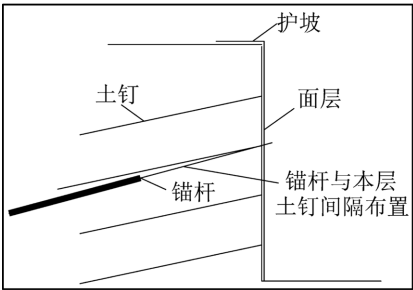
Schematic diagram of the prestressed anchor bolt combined soil nail wall support structure
